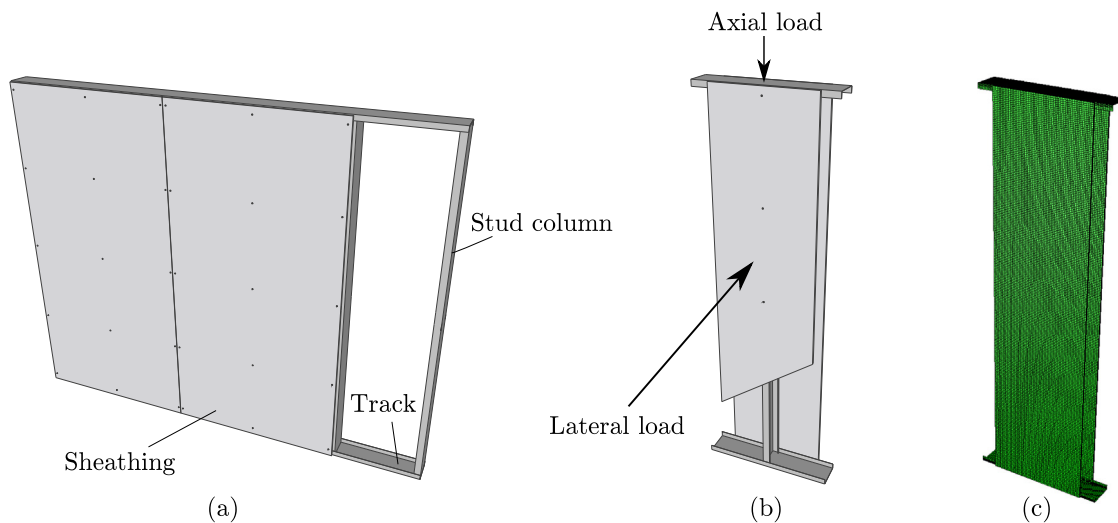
Illustrations of (a) stud wall with sheathing (b) single sheathed stud column under compression and bending about the major axis (c) finite element model.
